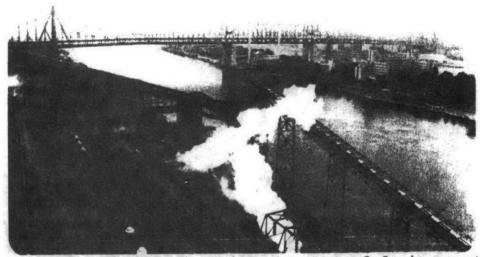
View from the boiler house roof facing southsouthwest. The coal crusher house is shown in the center of the photo. To its right and left, respectively, are shown coal conveyors A and B. The top half of the photo shows the 59th Street Bridge crossing the East River.
